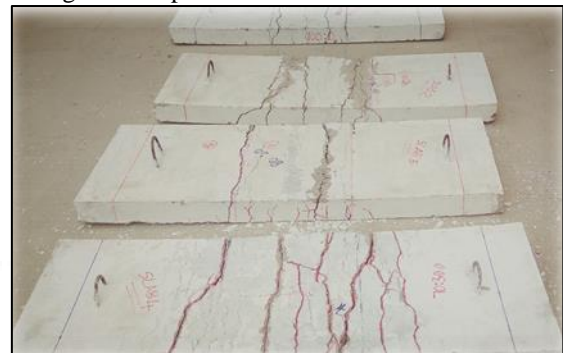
Flexural failure of a Slab under Two-Point Loading
